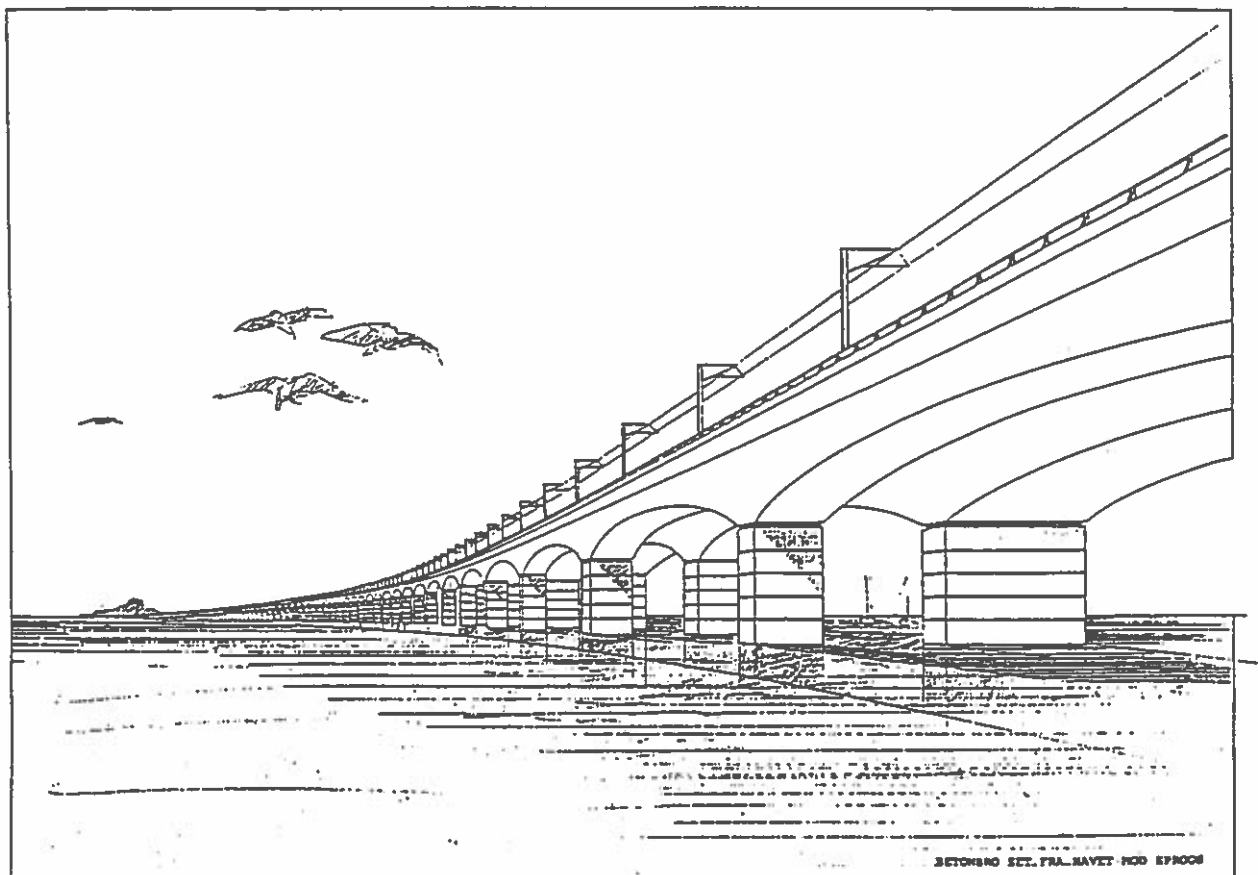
The 6.6-km West Bridge between Funen and Sprogø will be a concrete bridge carrying both railway and road links.
